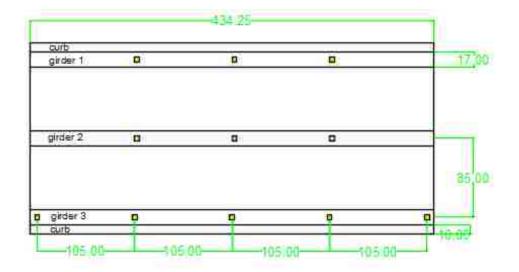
Span 1 Prism Layout (Dimensions shown in inches, 1 in. = 25.4 mm)
